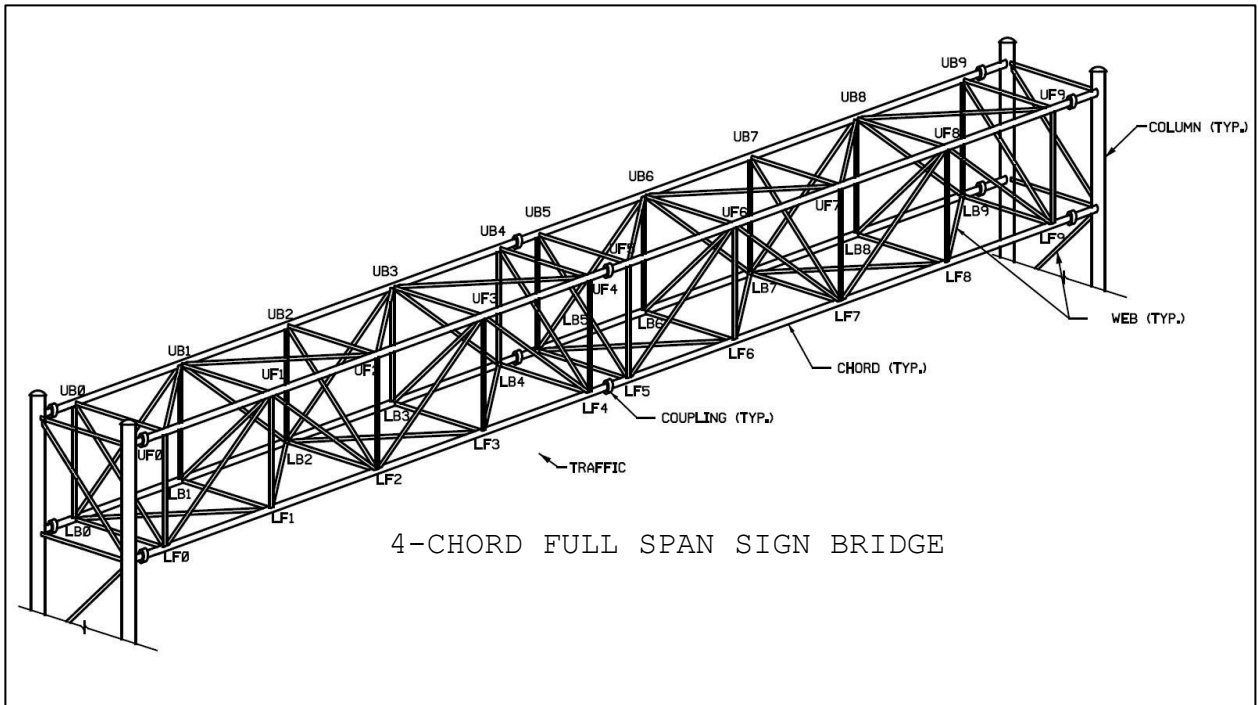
Typical Inspection Numbering System for 4-Chord Full Span Sign Bridge.
